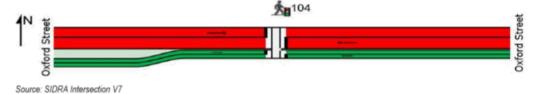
Oxford Street Mid-Block Crossing Layout (Proposed)
